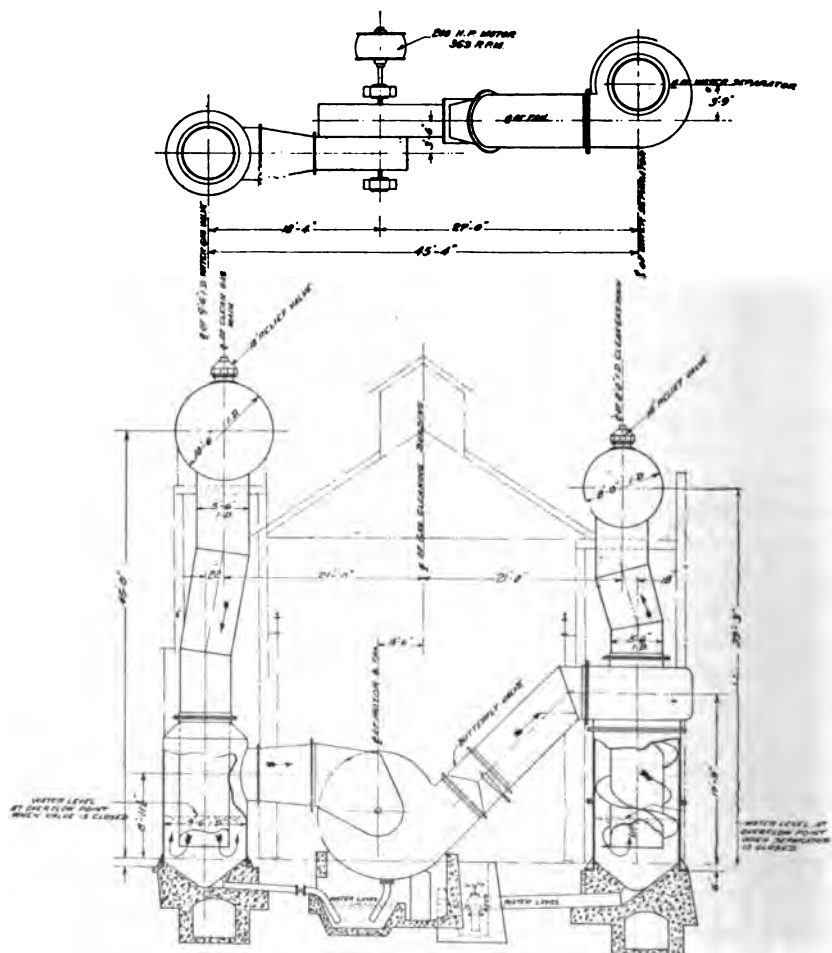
SECTION THROUGH FANS, AND METHOD OF PASSING GAS THROUGH SEALS AND SEPARATORS.
